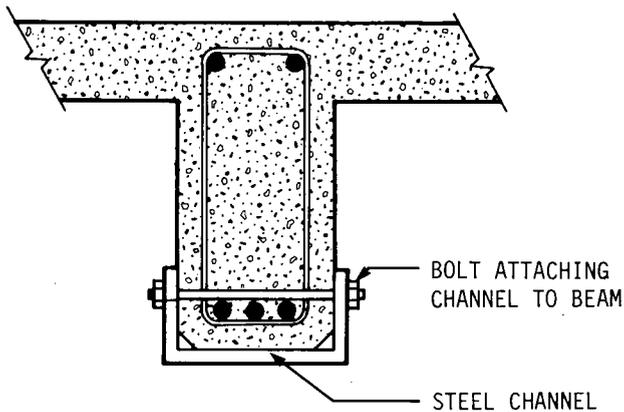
Addition of a steel channel to an existing reinforced concrete beam.
